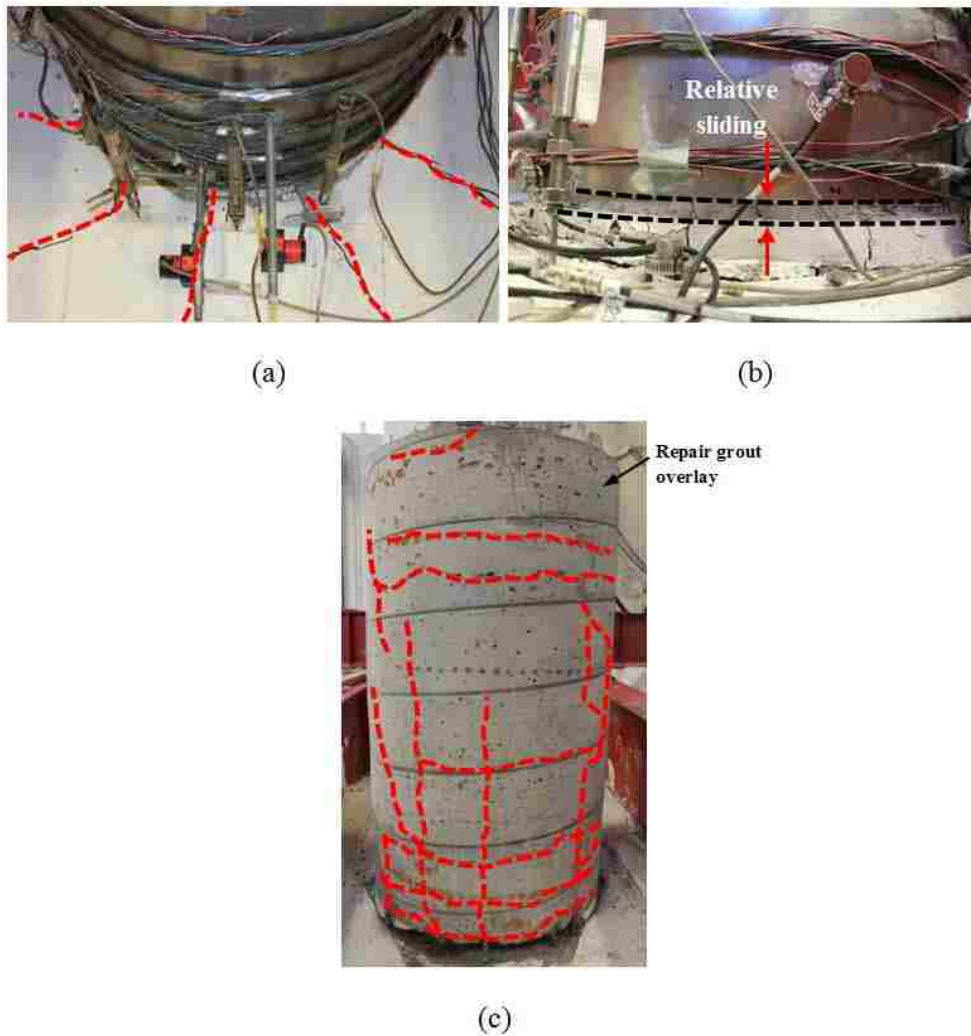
Failure modes: (a) concrete cracks on the top of footing associated with stress transfer through dowel bars in Column 1-R, (b) slip of steel jacket in Column 2-R, and (c) flexural cracks of repair grout overlay of Column 2-R after the jacket was removed at the completion of tests. Cracks are highlighted in dashed lines.
